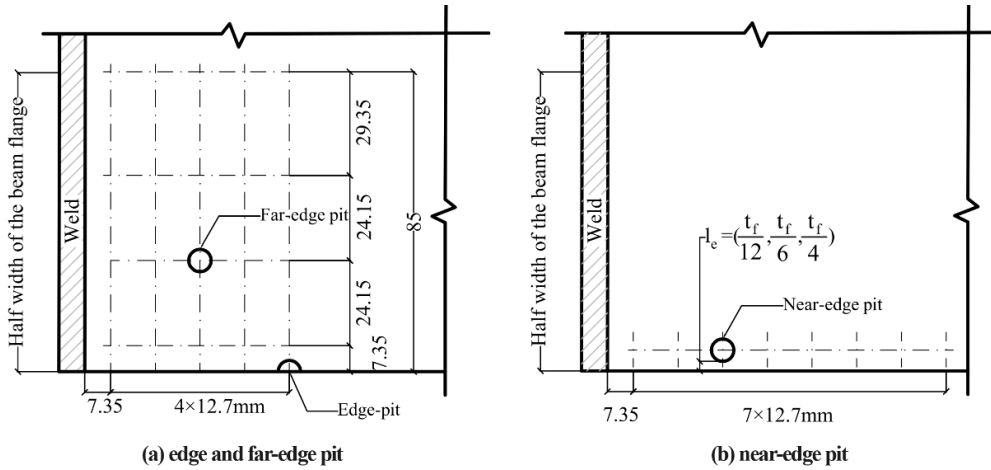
Pit location grid on the flange of the beam (all dimensions are in mm).
